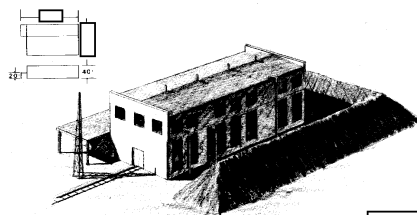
POSSIBLE NONDESTRUCTIVE TEST BUILDING (item 27, Figure 3).
